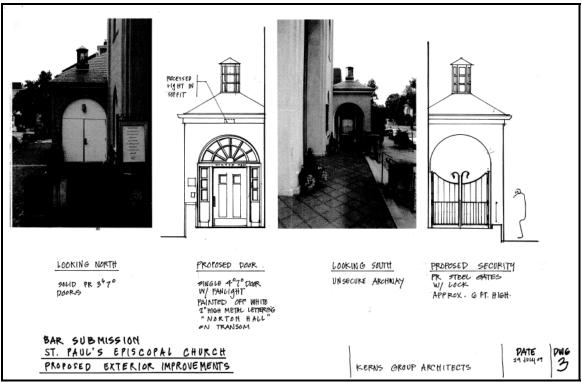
Proposed Norton Hall doorway & cloister entry gate.
